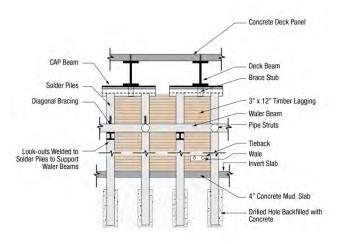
Pre-augering for Soldier Pile Cover with Soldier Pile and Lagging
